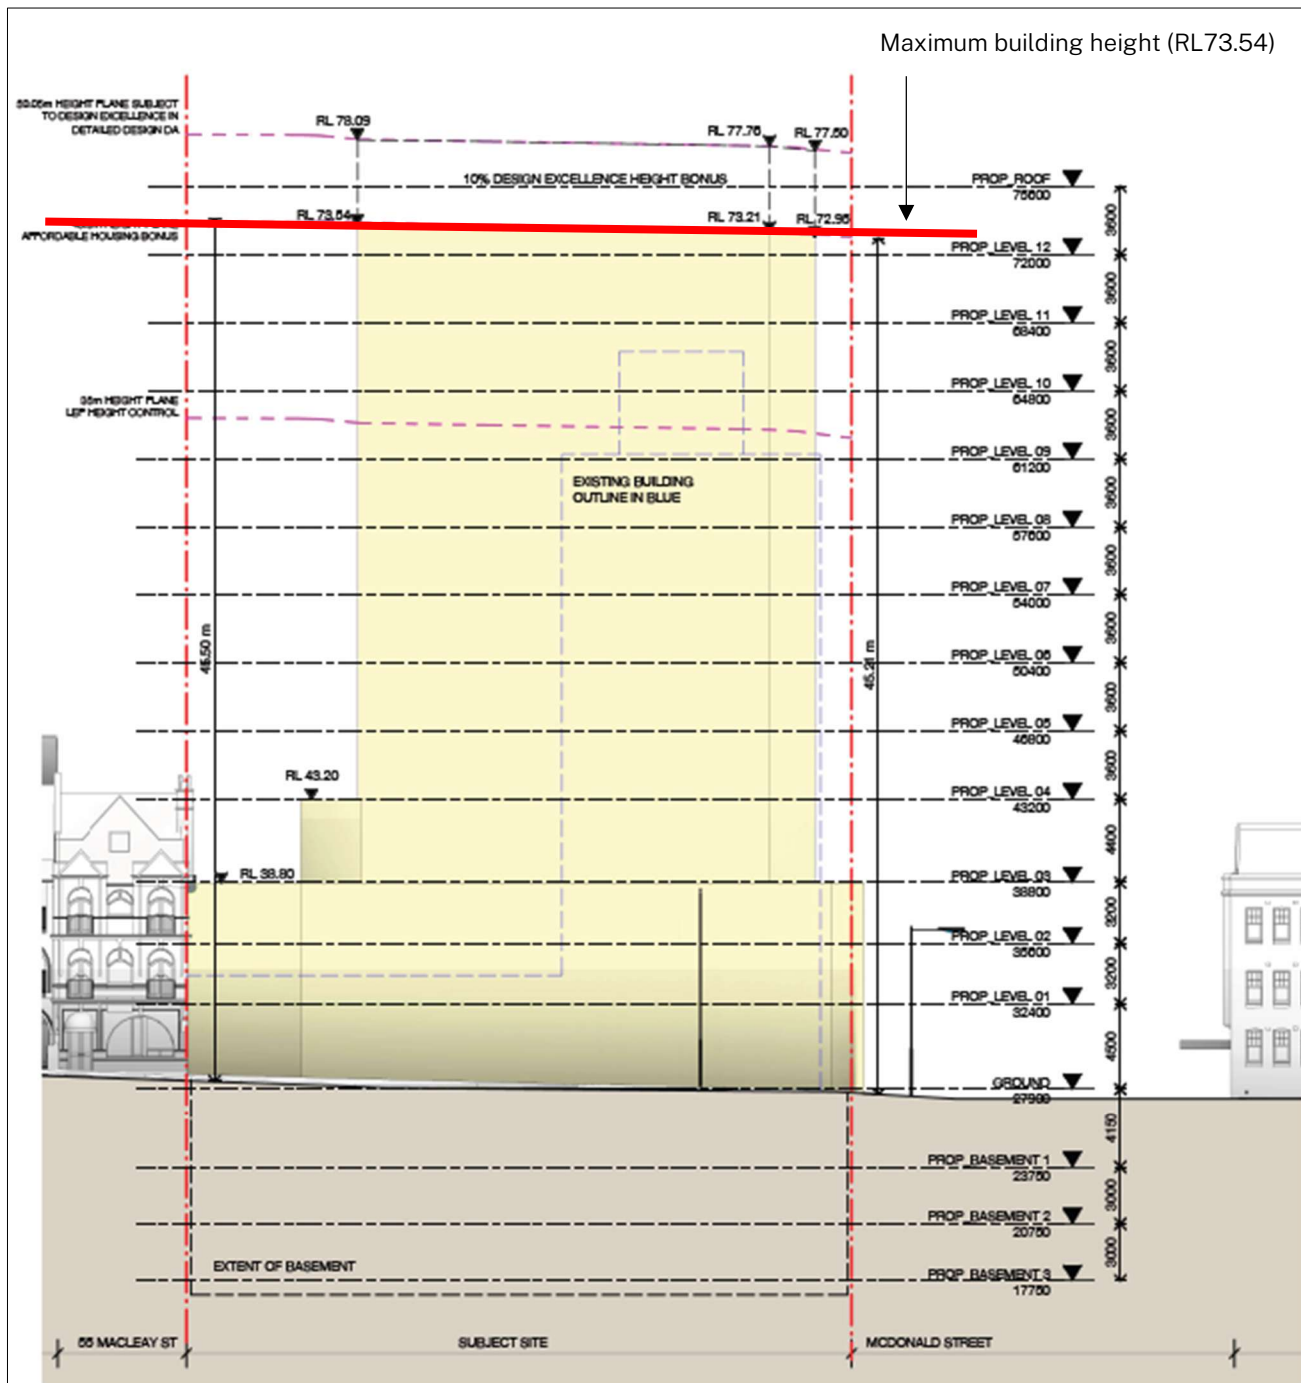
| Concept building envelope (Macleay Street elevation) (Source: Applicant's EIS)
